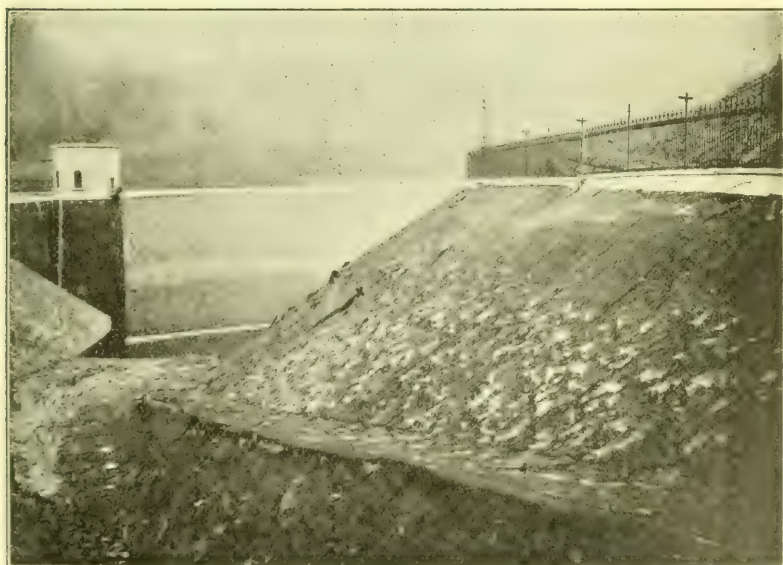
RESERVOIR NO. 4: CRACK IN OUTER EDGE OF INCLINED ROADWAY, AND IN FACE OF SLOPE ABOVE SUB-RETAINING WALL, SEPTEMBER 26TH, 1897.
